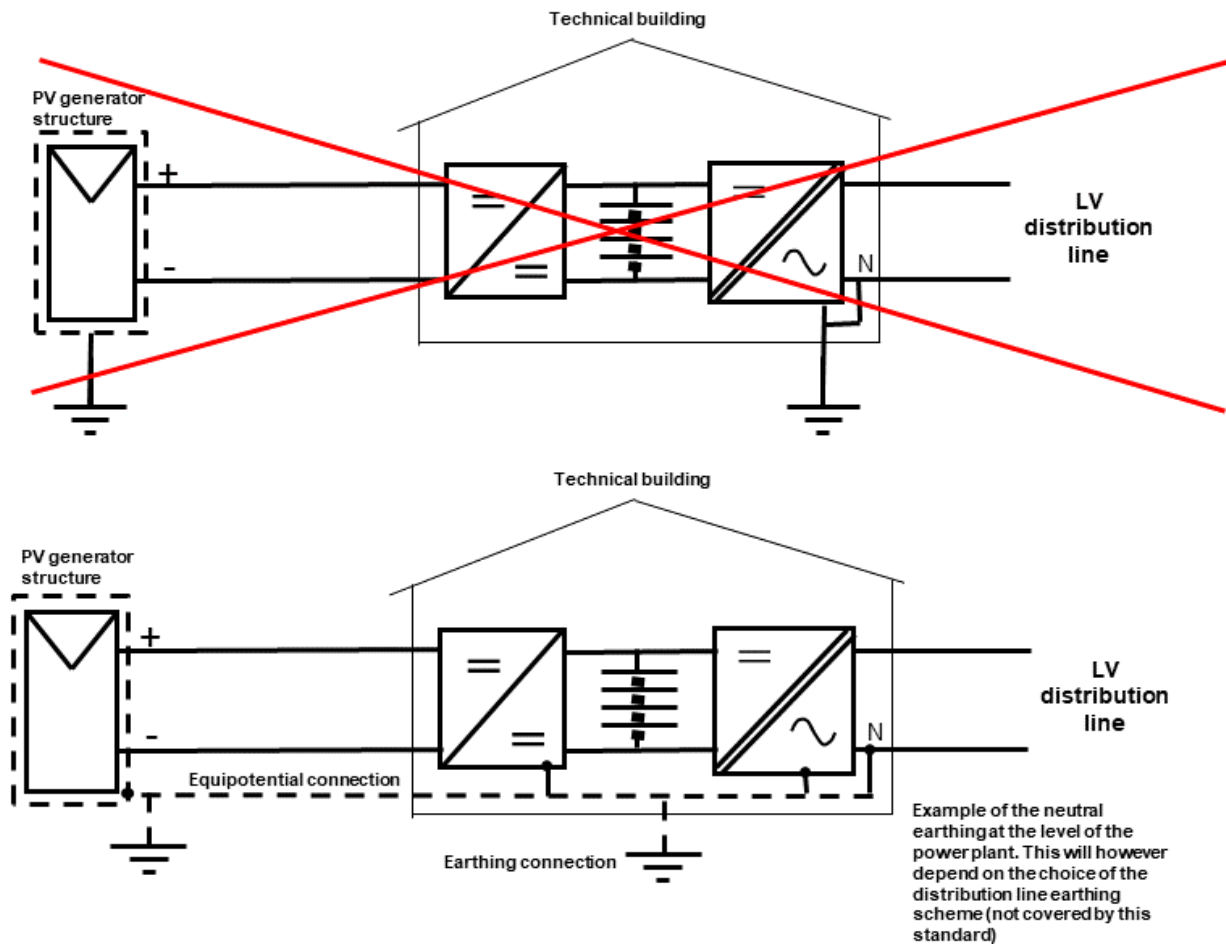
Examples of good and bad wiring of the equipotential bonding and earthing system
